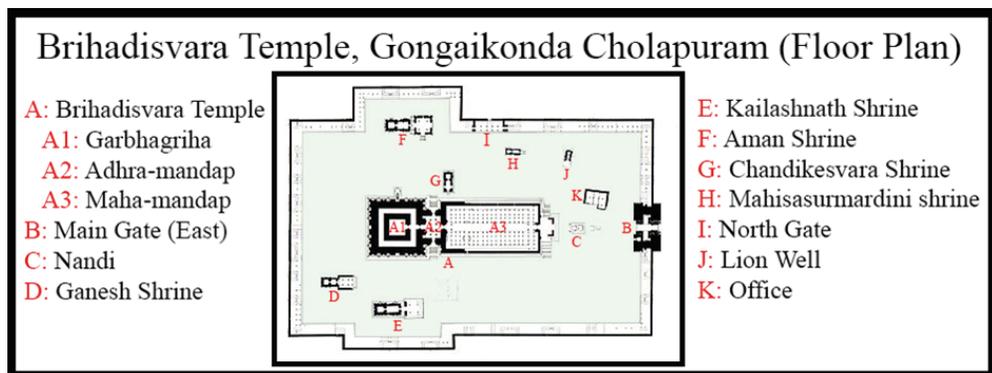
Floor plan of Brihadeshwara Temple, Brihadeshwara Temple, Gangaikonda Cholapuram
